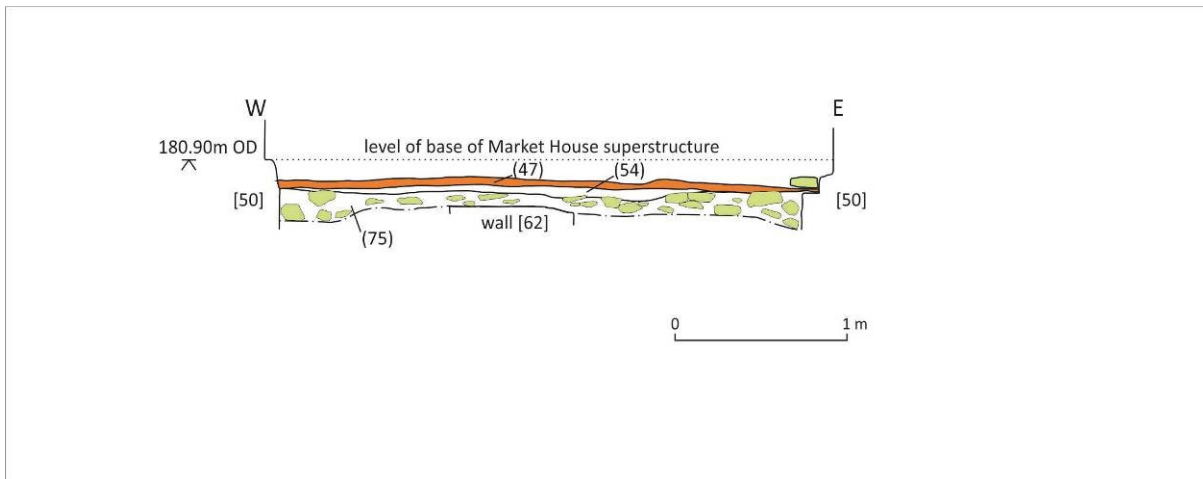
North facing section through clay slab (47) showing relationship to Market House foundations, planned floor level, and underlying wall [62]
